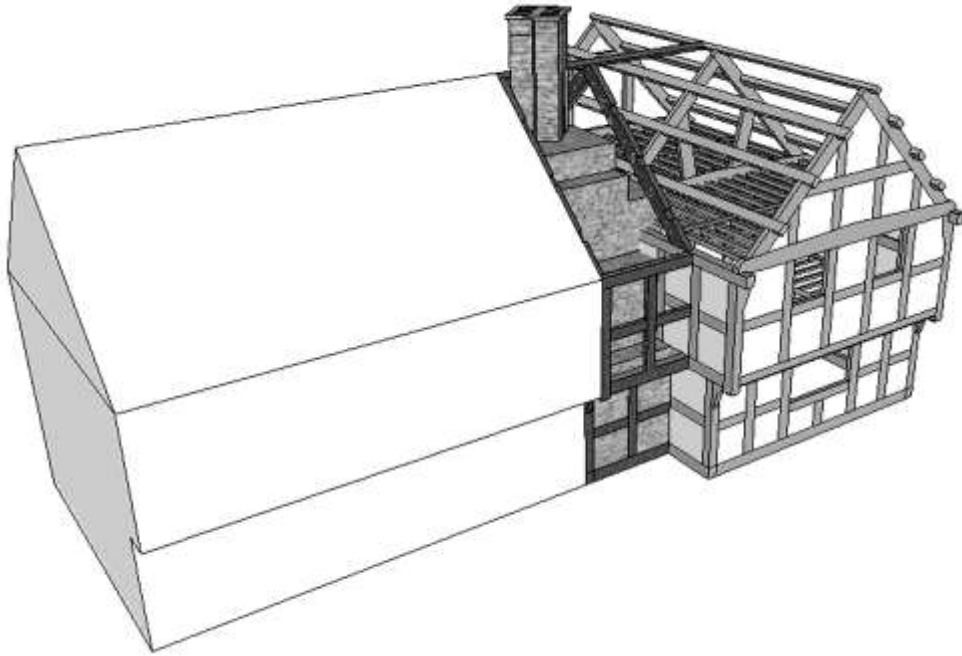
New House Farm, Moccas. Reconstruction sketch showing the south elevation of the crosswing and lost ceiled-hall range
